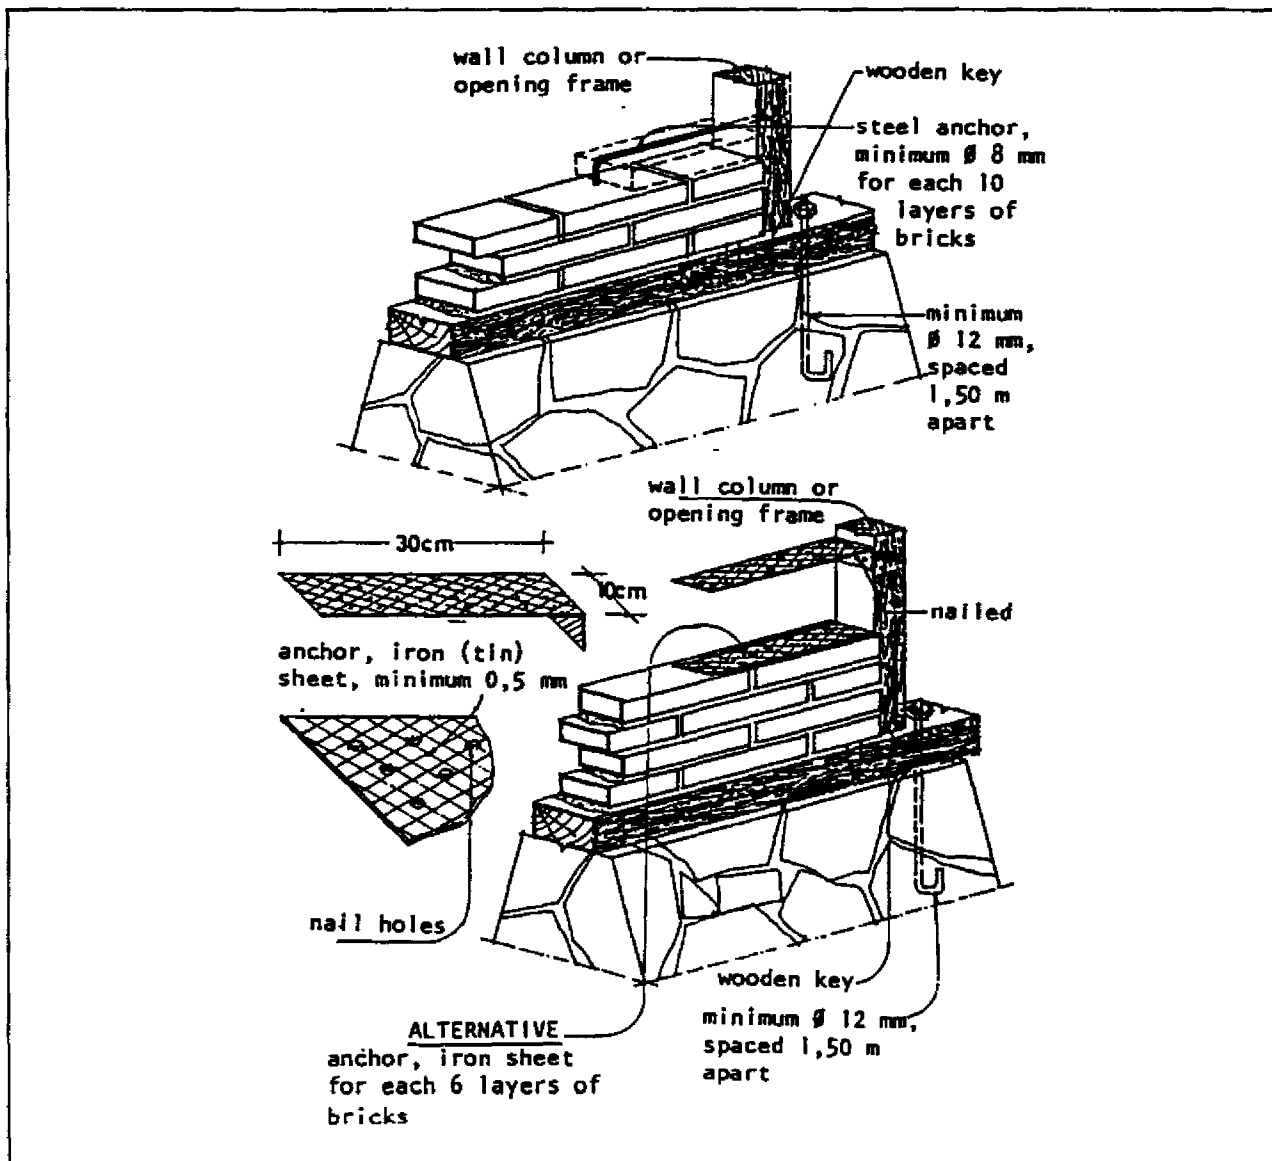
Connection of Wooden Frames with Brick Masonry [4].
